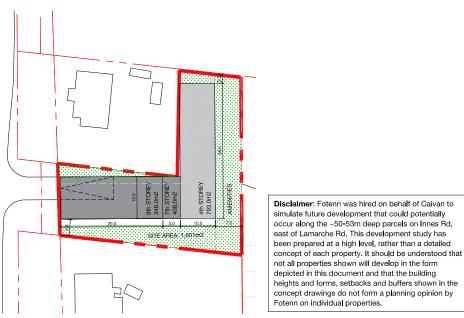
Mixed-Use Block (Concept Plan - Option 1).
